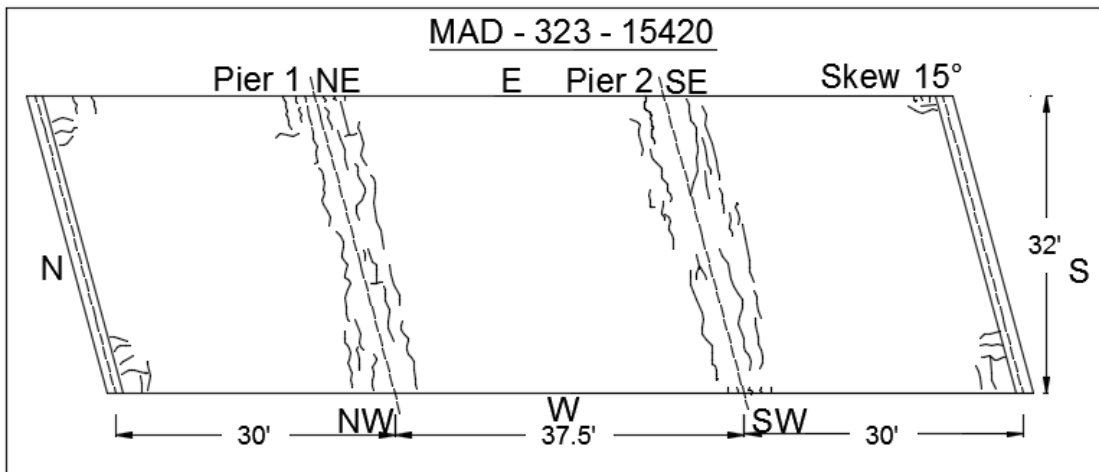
Bridge Inspection Pictures and Crack Map – MAD-323-15420
